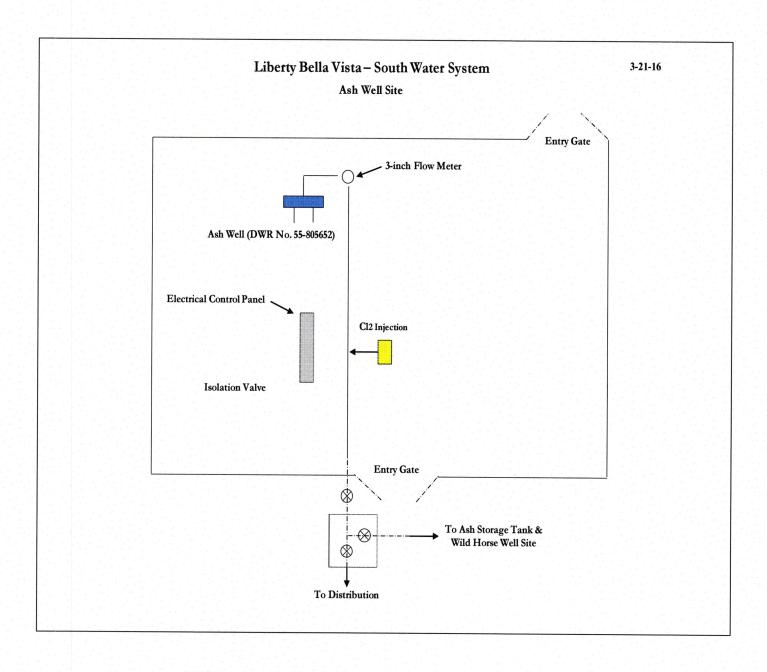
SOUTH WATER SYSTEM ASH WELL SITE
